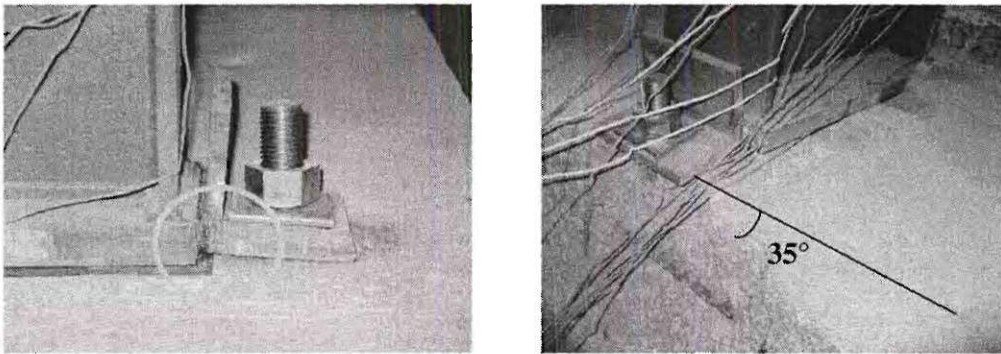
Onset of weld fracture of angle (left) and concrete breakout at 35° on concrete pier (right)
